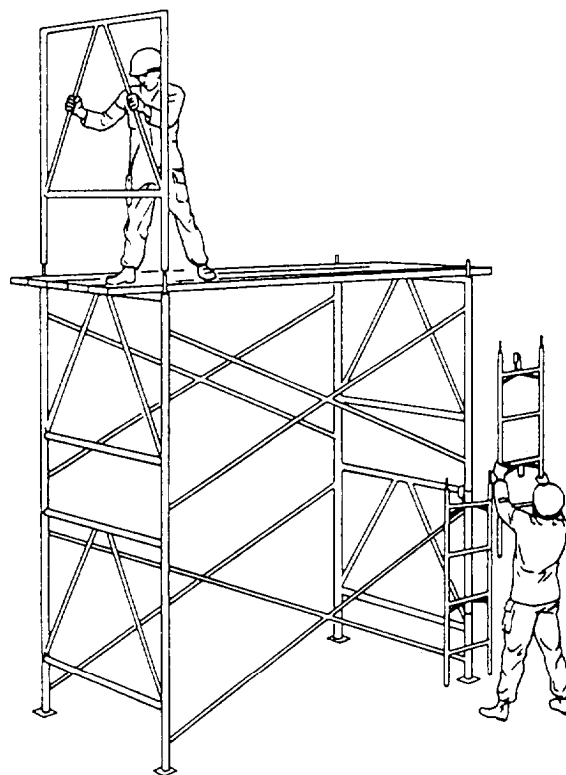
Assembling prefabricated independent-pole scaffolding.
